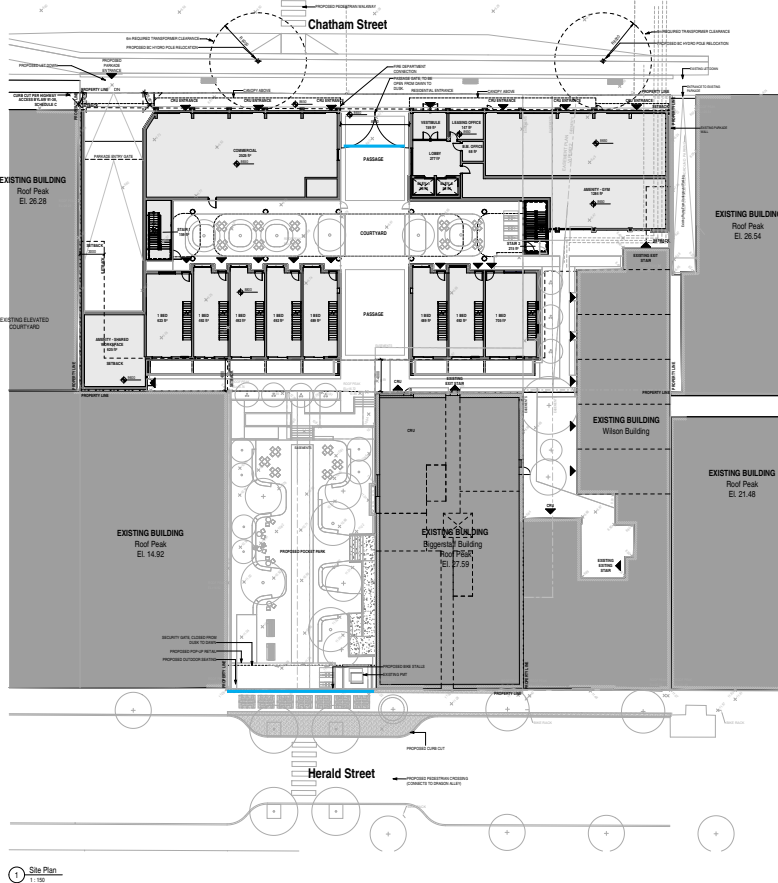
Site Plan indicating proposed gates at the north and south ends of site, to be closed from dusk to dawn.
